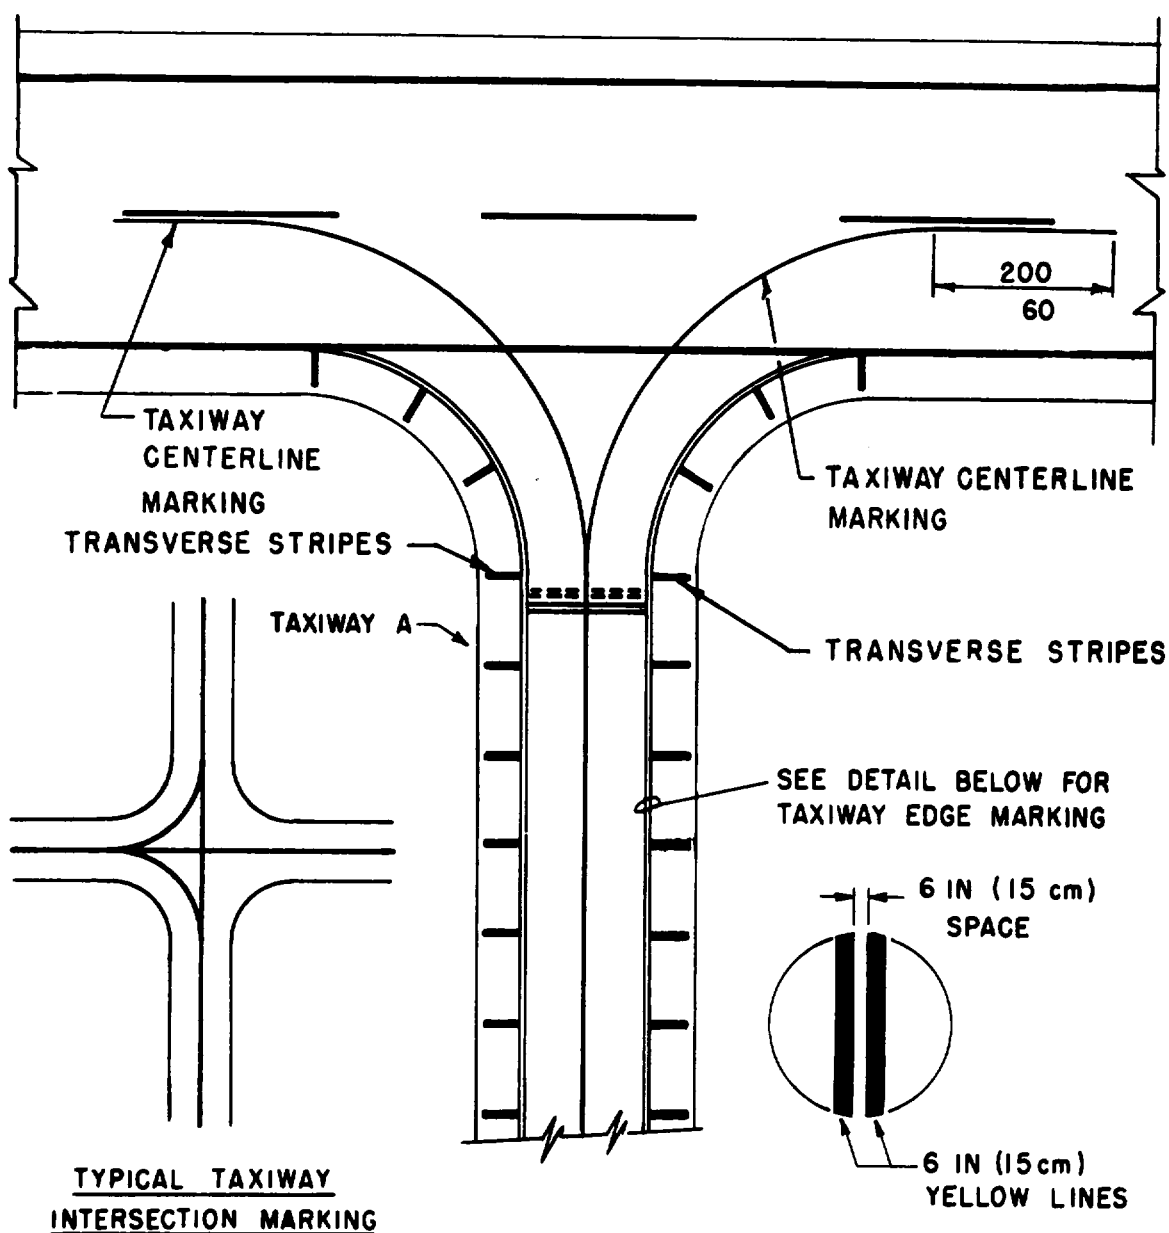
Taxiway/runway intersection marking. (Sheet 2 of 2).
